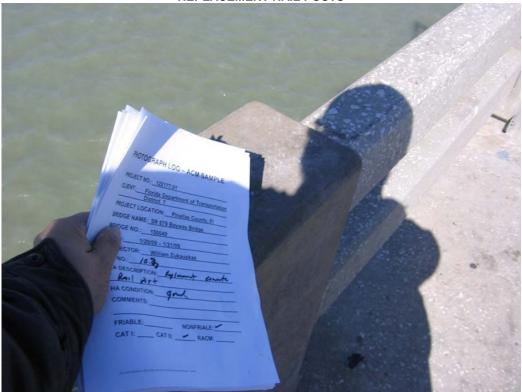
01/21/09 - SAMPLE 10.3 - HA 10 CONCRETE REPLACEMENT RAIL POSTS
